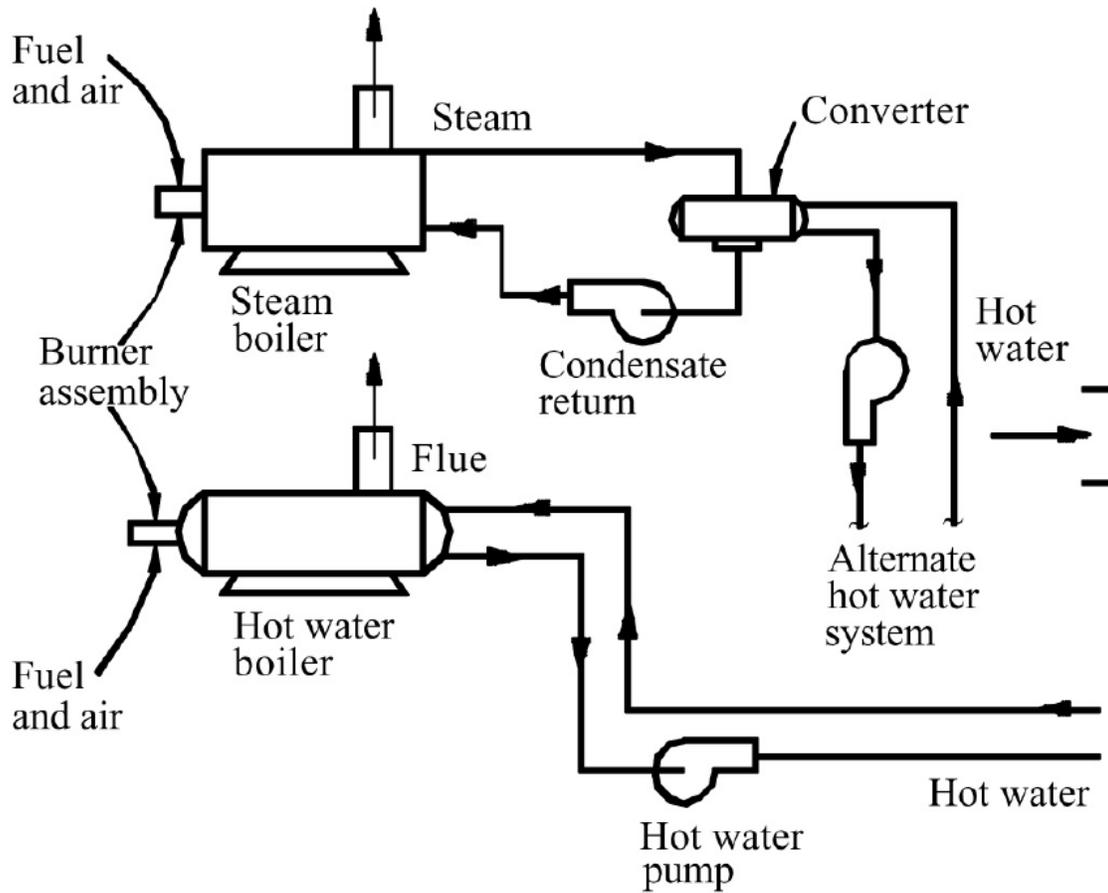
Figure 7-1. Steam and Hot Water Boilers
